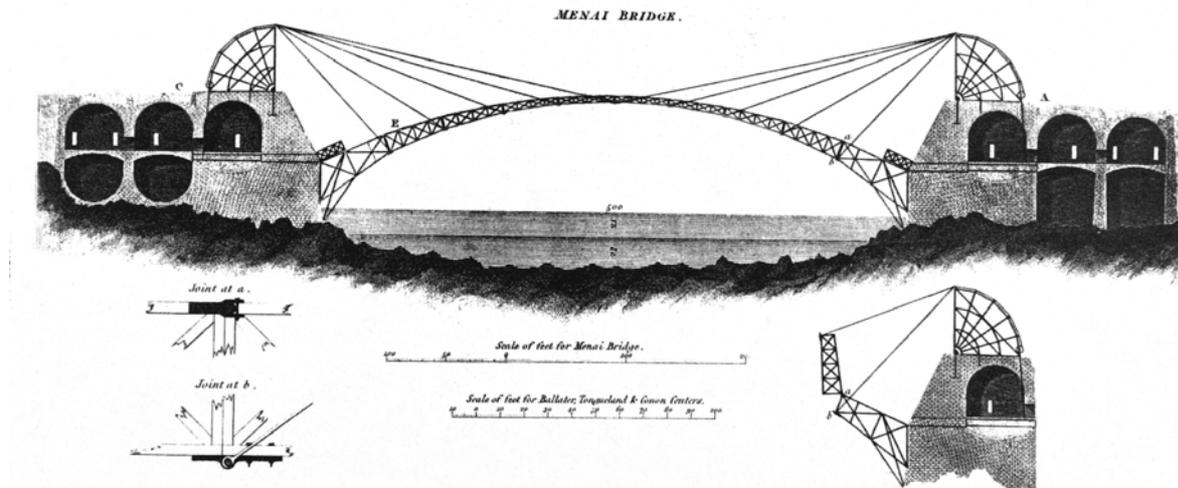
Telford's proposal for a suspended centering upon which to built the cast-iron arch. (Telford²)
